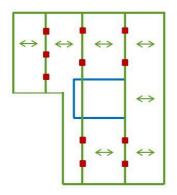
Floor plan that shows what materials that were used, green stands for timber, blue for concrete and red for steel.
